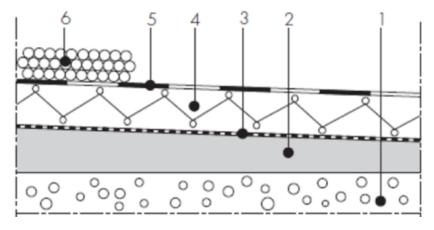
CROSS-SECTIONAL BALLASTED ROOF STRUCTURE
